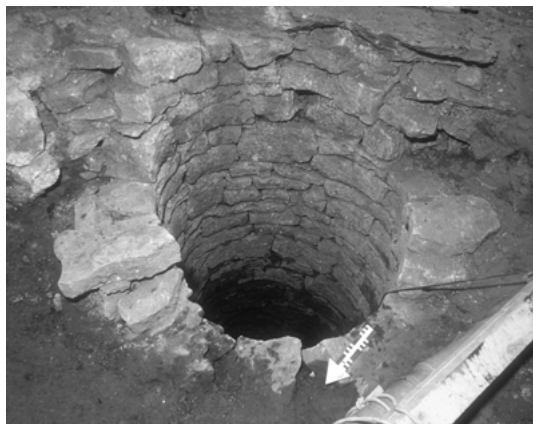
Göttingen, a well of local limestone behind the building in Rote Straße 30. The well is built over a wooden frame.
